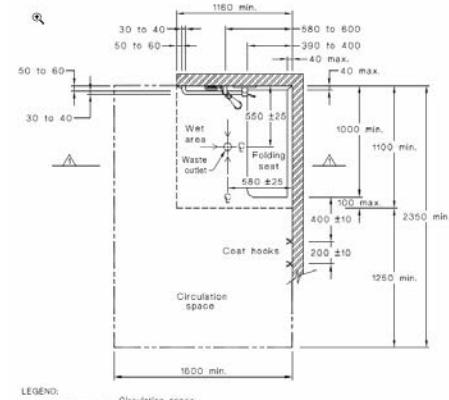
SHOWER RECESS FITTINGS—ELEVATION
